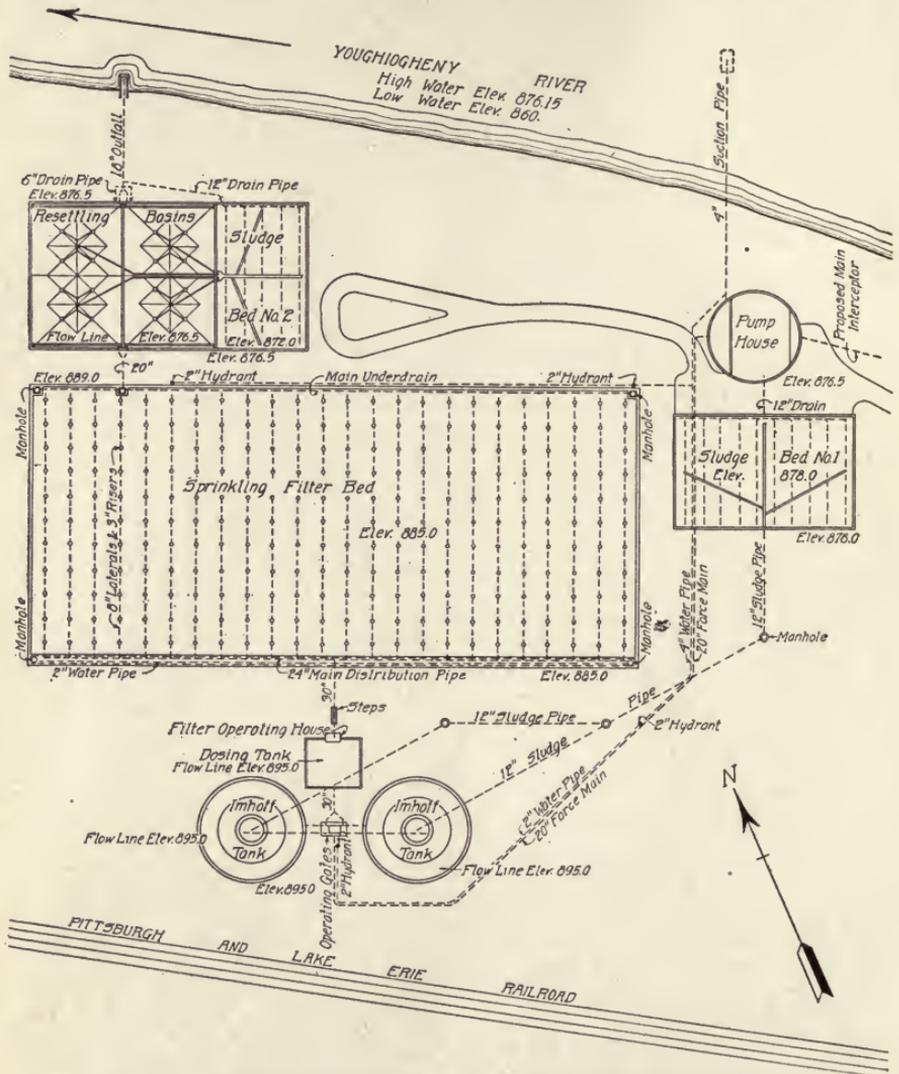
Plan of Sewage Disposal Plant at Connellsville, Pennsylvania
